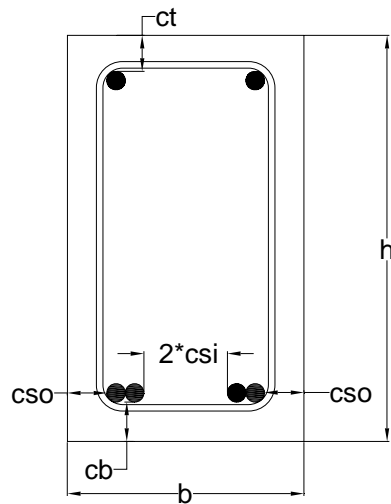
General cross-section for beam specimens (#8 and #11)
